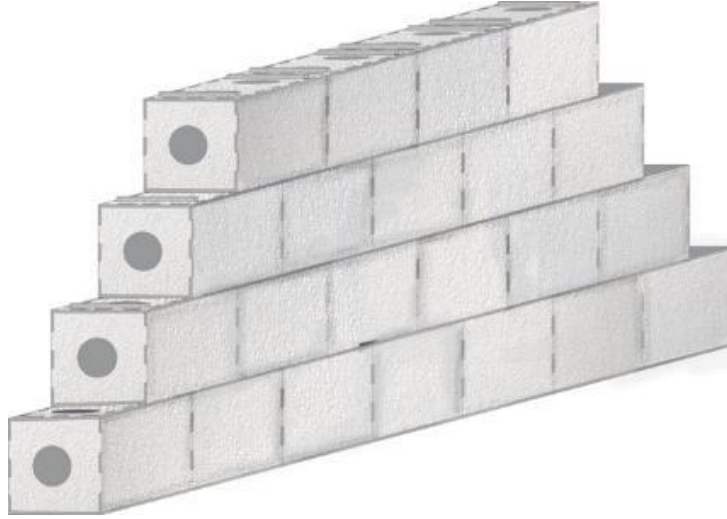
3D visual of the wall built with the proposed construction blocks (Baz & Mıhçıođlu, 2021)
